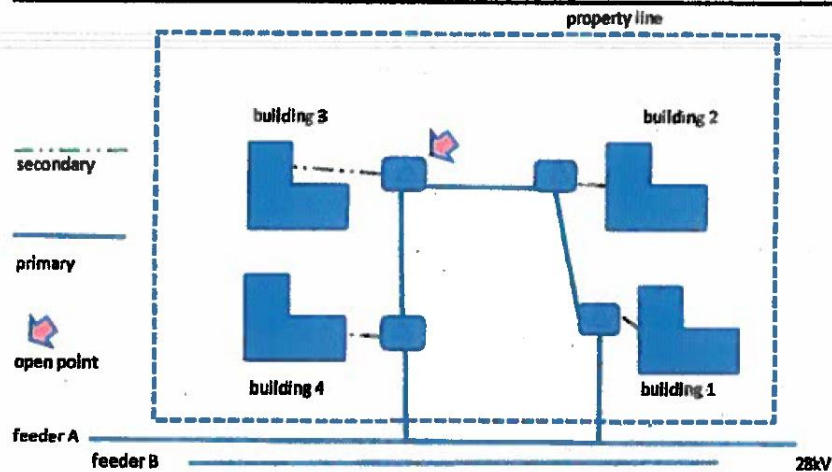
MULTI BUILDING CONNECTION greater than 1,000kVA
